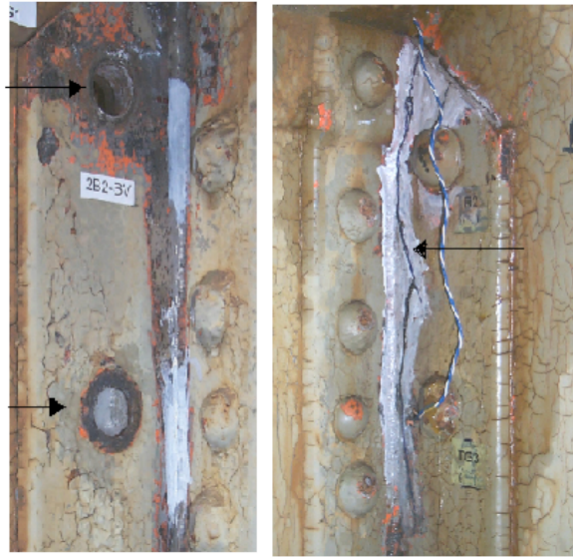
Fatigue damage in a stringer-to-floor-beam connection: Cracking in the rivet (left) and cracking in the connection angle (right).
